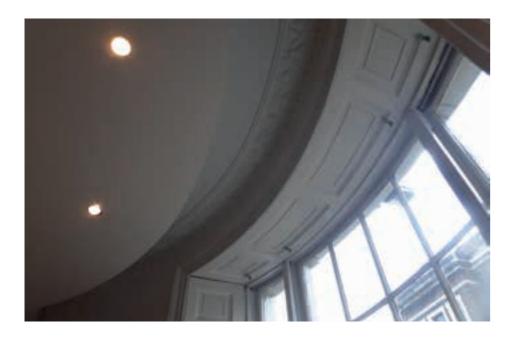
Suspended ceiling in rear room to ground floor of no. 43
